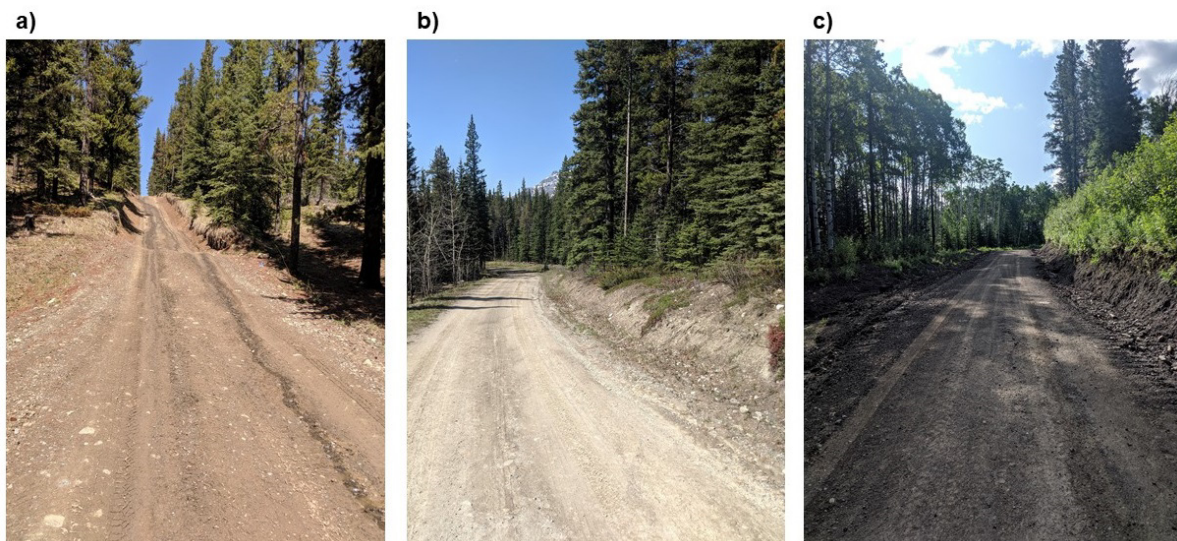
Road types with the studied watersheds. a) Permanent 4x4 trail - Waiparous Trail b) Ungated gravel road - Sutton Road c) Temporary gated gravel road - Mclean Creek Road
